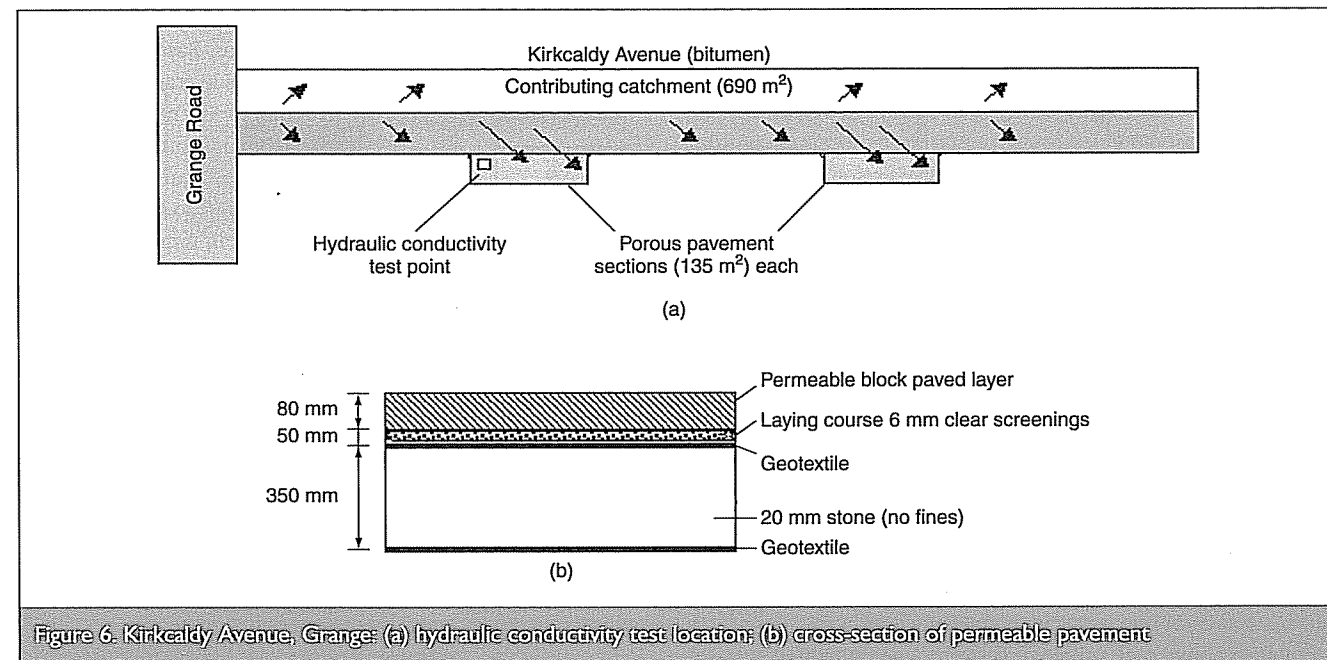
Kirkcaldy Avenue, Grange: (a) hydraulic conductivity test location; (b) cross-section of permeable pavement
